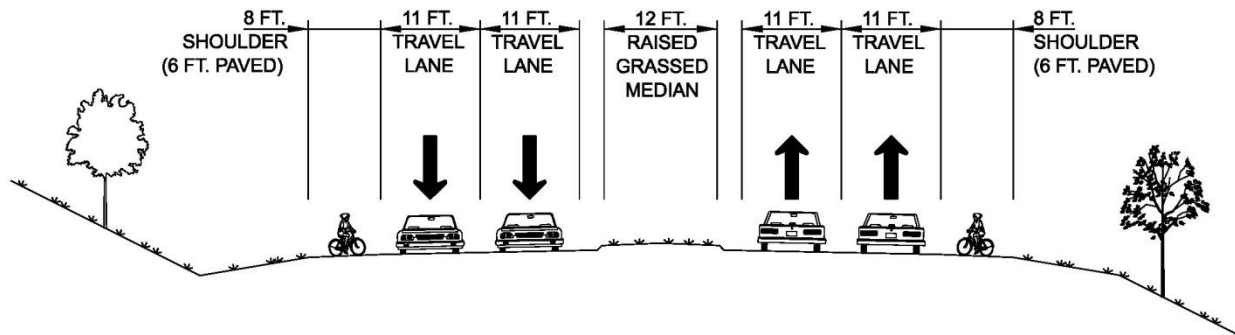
SEGMENT 3B PROPOSED TYPICAL SECTION
